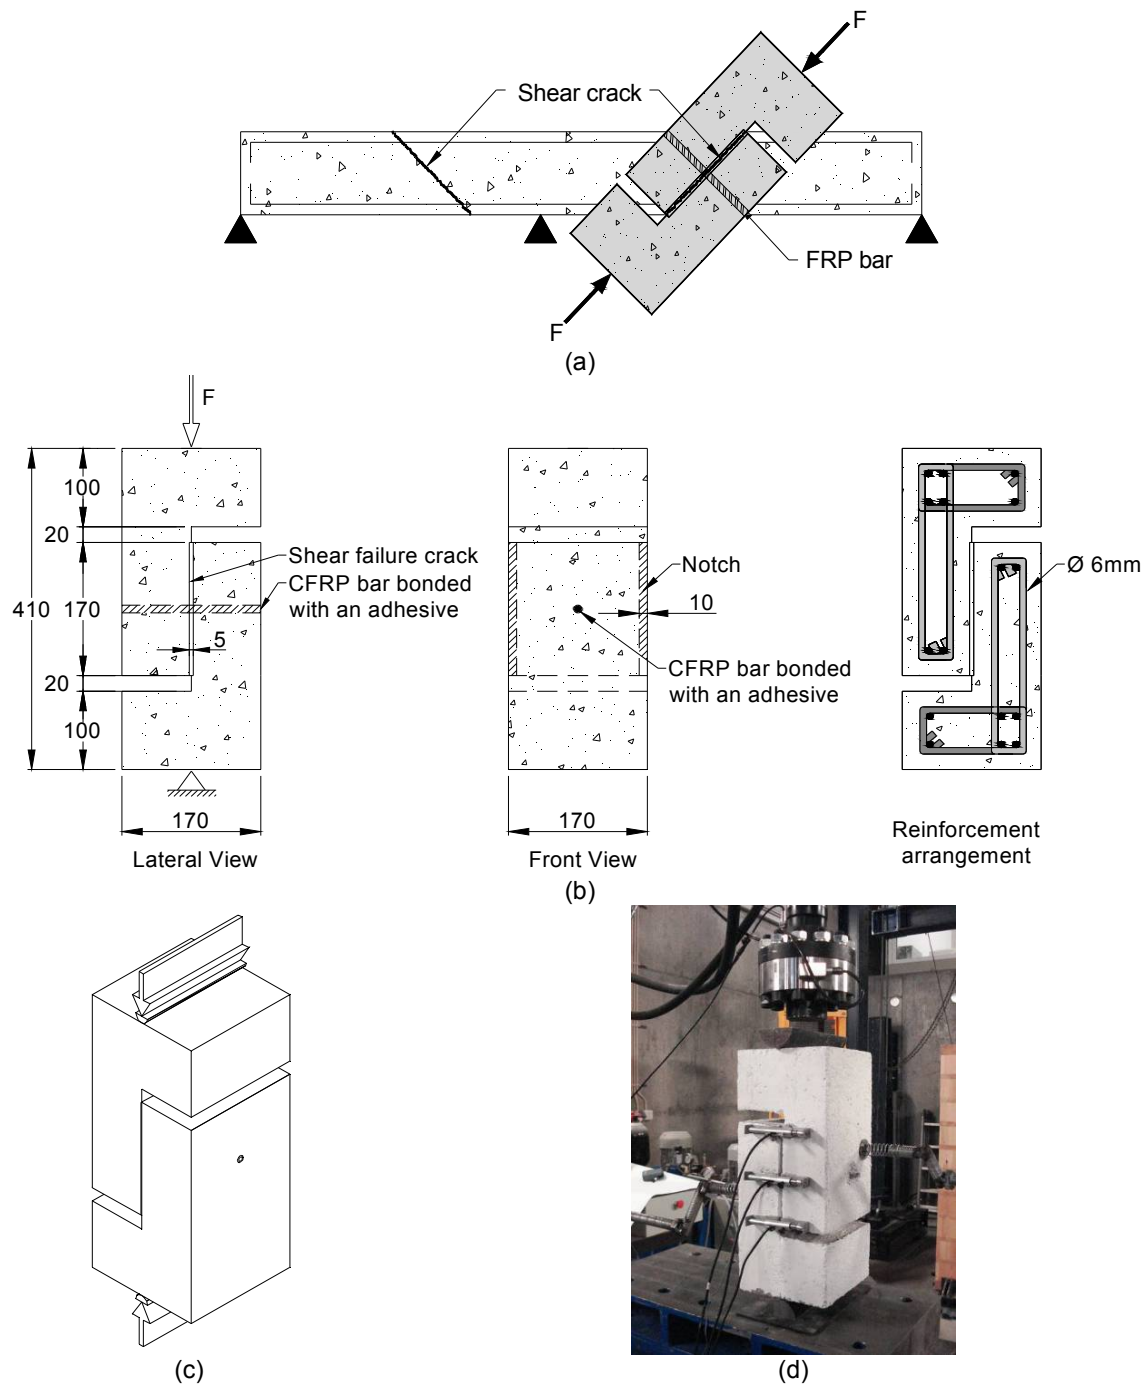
(a) Concept, (b) specimen cross-section dimensions (in mm); (c) 3D perspective of the specimen; (d) photo of the test setup
